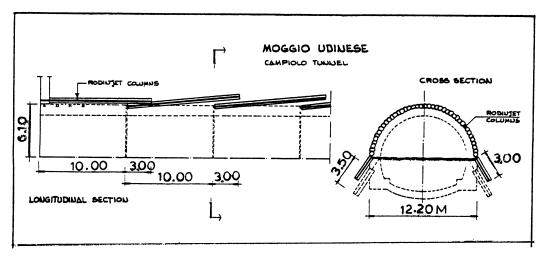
Jet grouting columns to protect tunnel excavation. Moggio Udinese (Tornaghi and Cippo, 1985)
